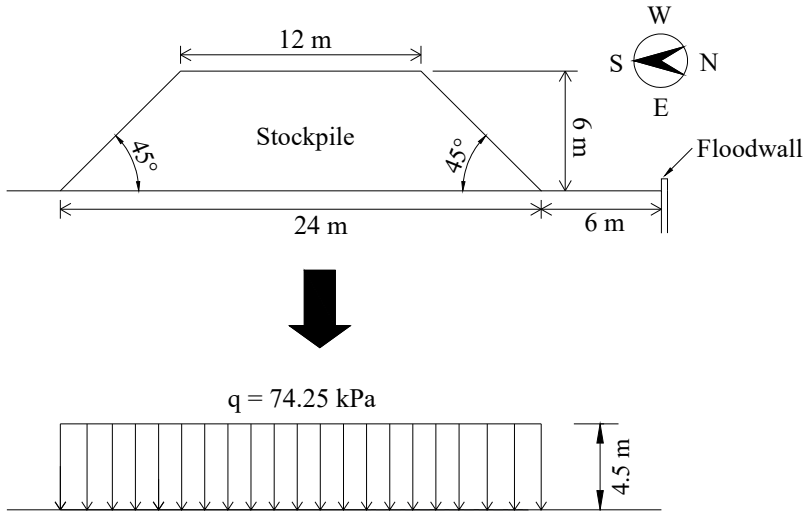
Cross-section of stockpile No. 2 buildings 10 and 11.
